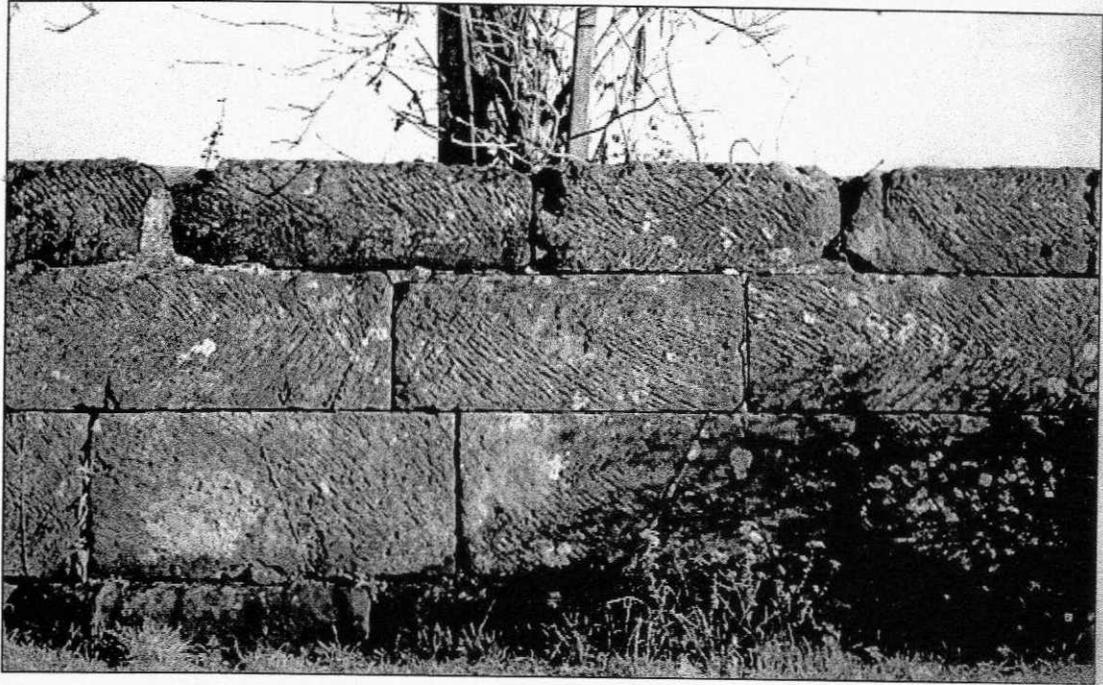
(above): Section of tooled red sandstone wall on eastern side of farmyard
